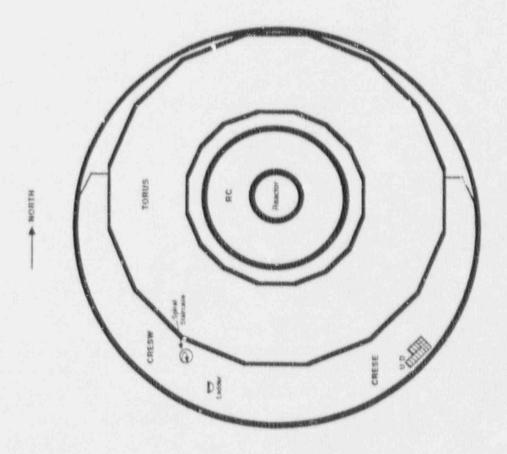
Fitzpatrick Reactor Building Elevation Views (page 5 of 5)
